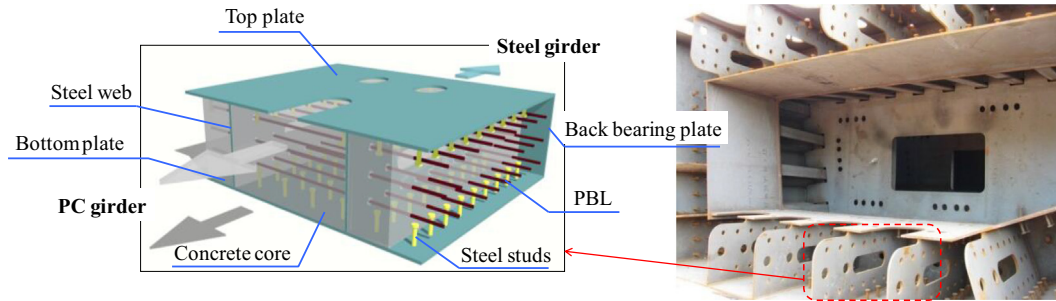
Schematic View of Typical CFSC in a Steel-Concrete Joint.
